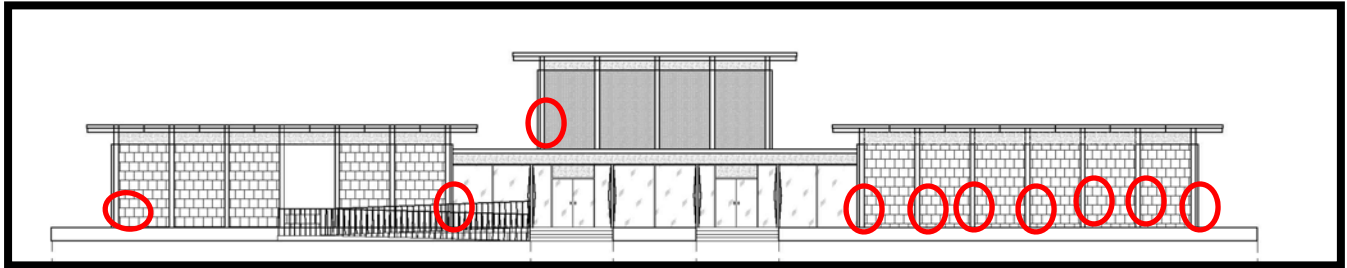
SOUTH ELEVATION COLUMNS REQUIRING REPAIR
